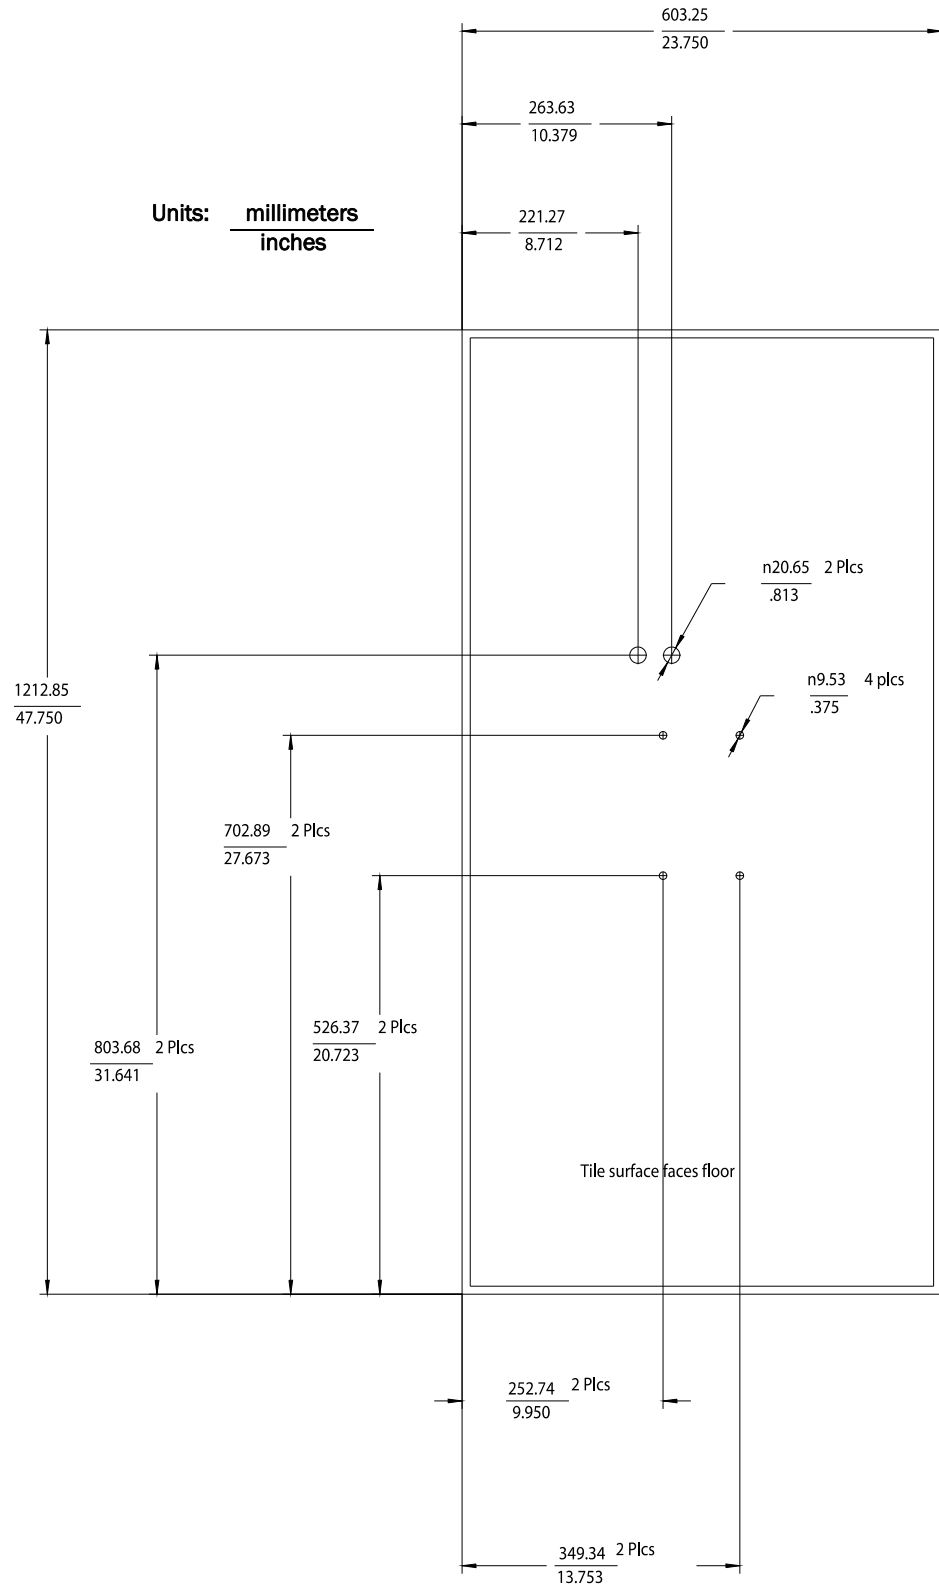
Core AP Below Ceiling Tile Hole Locations and Dimensions
